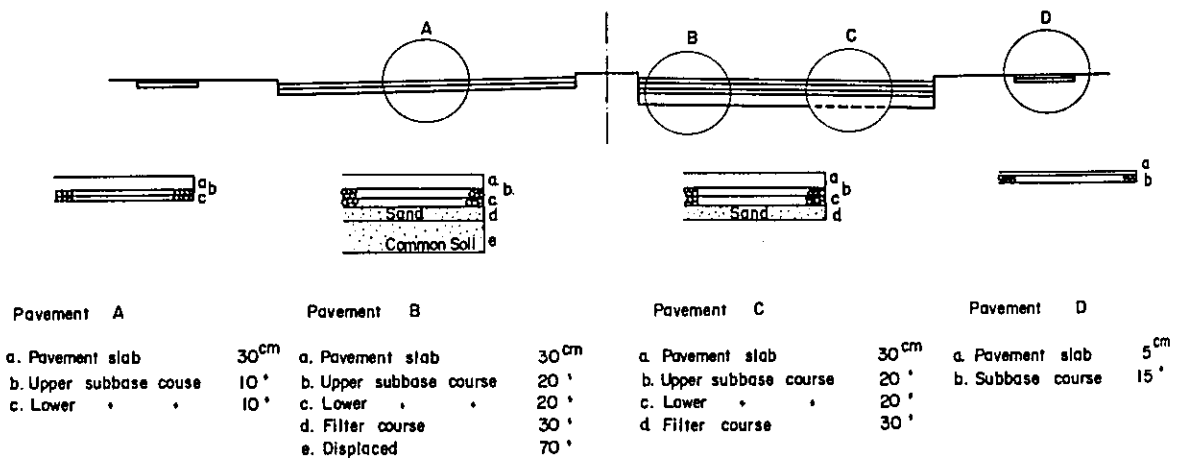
STANDARD THICKNESS OF PAVEMENT
